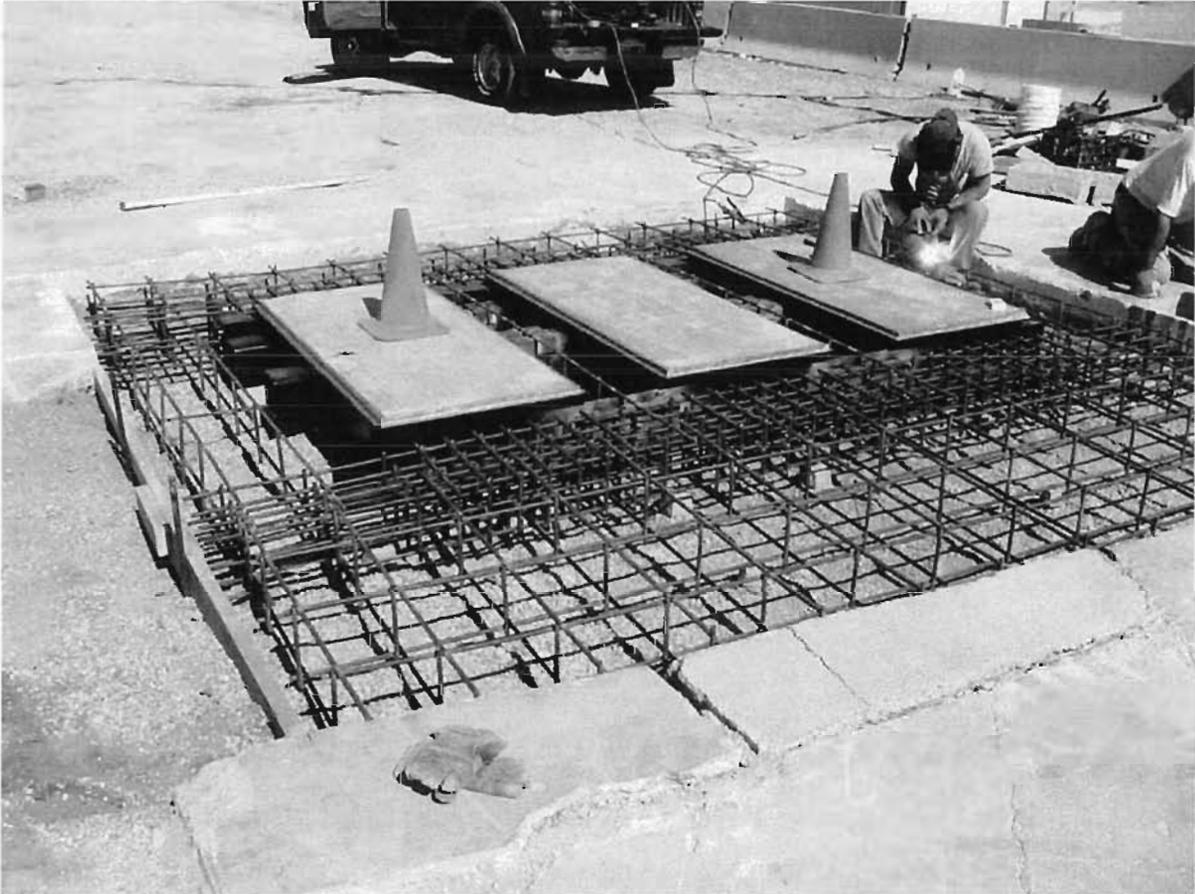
Three DSC2000 Phalanx Barriers installed on U.S. Department of State spacing of 42 inches [107 cm]. The two rebar beams have been installed and the lighter outer rebar placed about them. All bars are size 4 (0.5 inch [13 mm]). Note that the Barriers are placed directly in the 11 inch [28 cm] deep excavation. Plywood has been placed on the ramp plates to protect the finish from the concrete pour.
